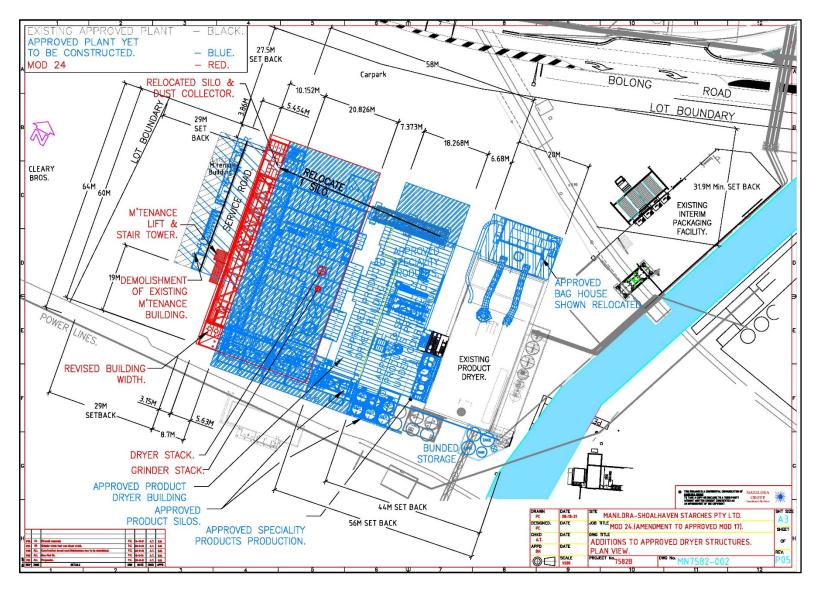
Plan of proposed modification to GD8 building and relocation of silo and associated dust collectors.
